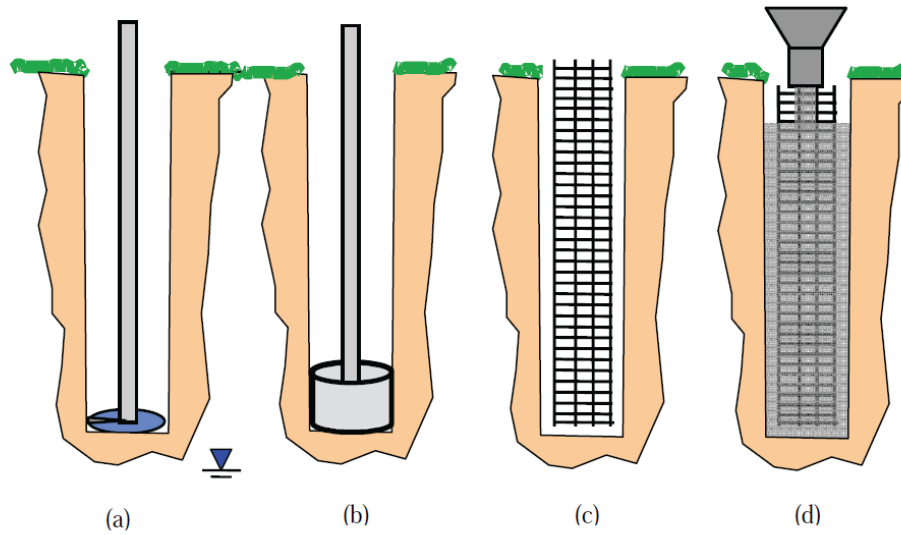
Dry Method of Construction: (a) Drill the hole; (b) Clean the Base; (c) Place Reinforcement; (d) Place Concrete
